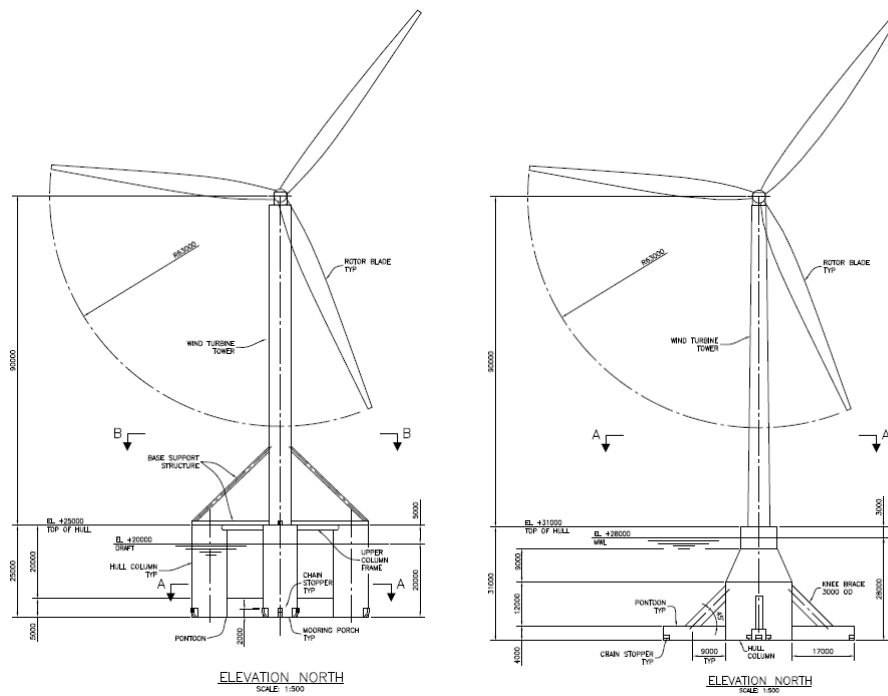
Three and Mono Column TLP Type OWT Drawings
